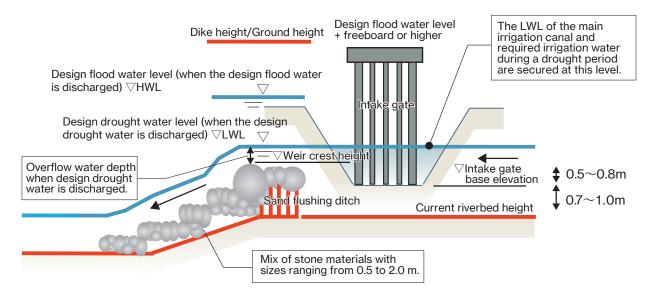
Design Specifications for Intake Weir/Gate Elevation Setting 2)
